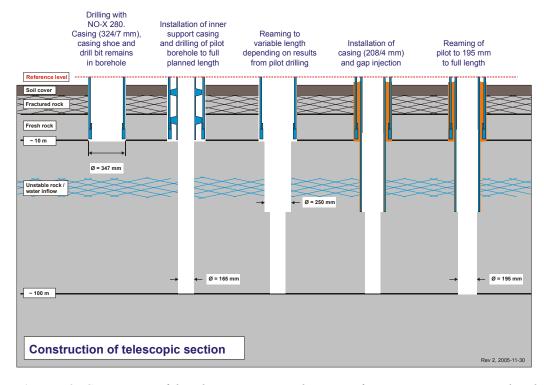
Construction of the telescopic section. The cement for casing grouting is introduced between the casing and the rock wall. The drill bit acts as a barrier so that cement does not enter the pilot hole.
